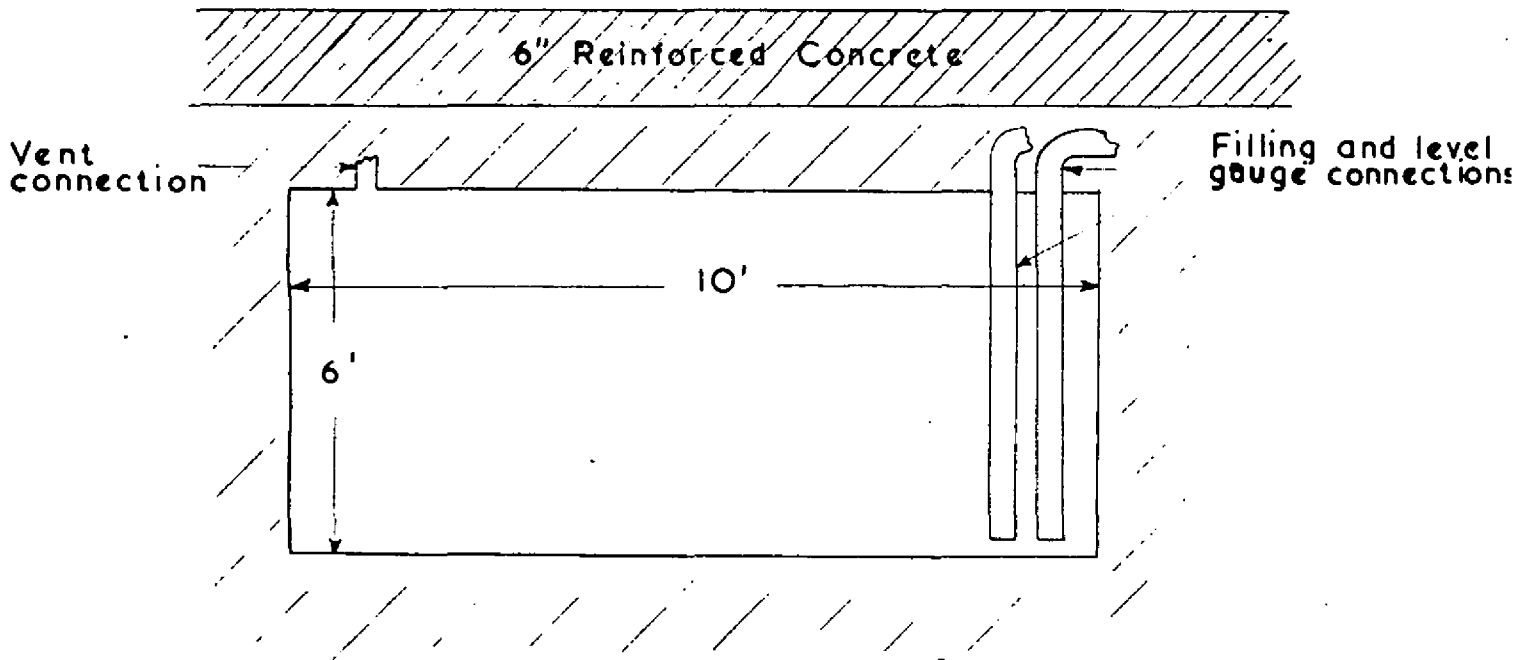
PROBABLE LAYOUT OF THE TANK BEFORE THE EXPLOSION.
